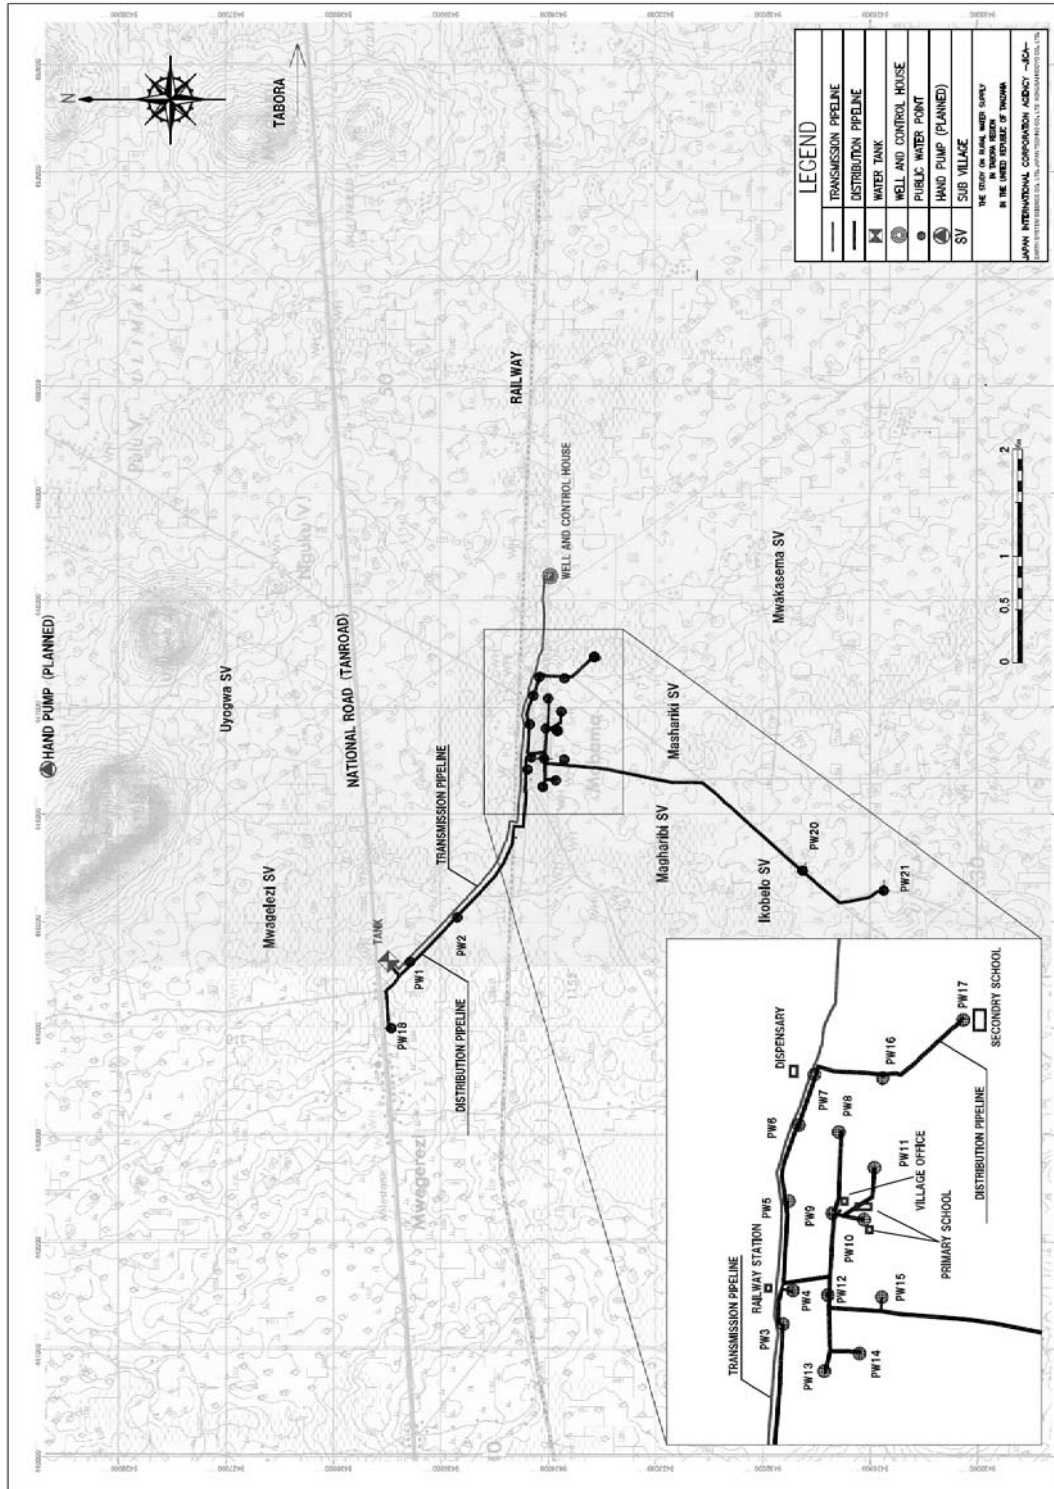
Layout Plan of Mabama Village, Tabora Rural District
